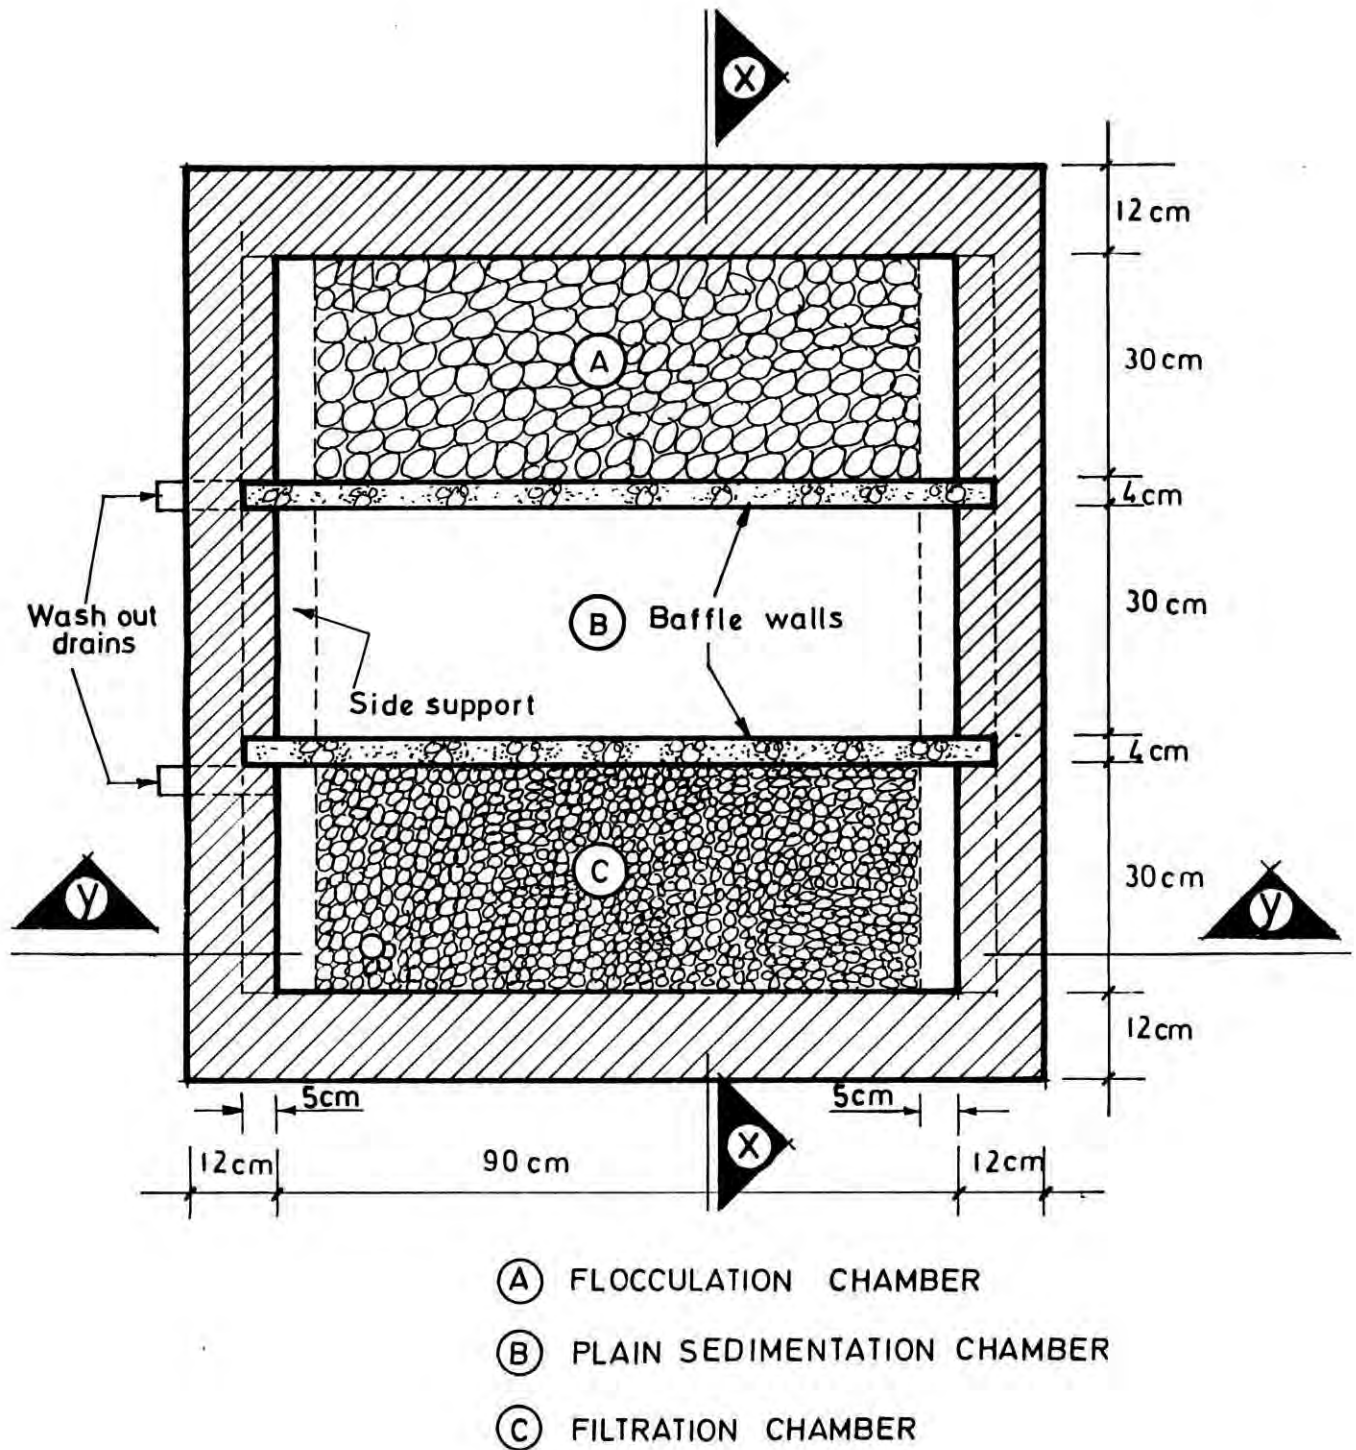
PLAN OF THE IRON REMOVAL PLANT
